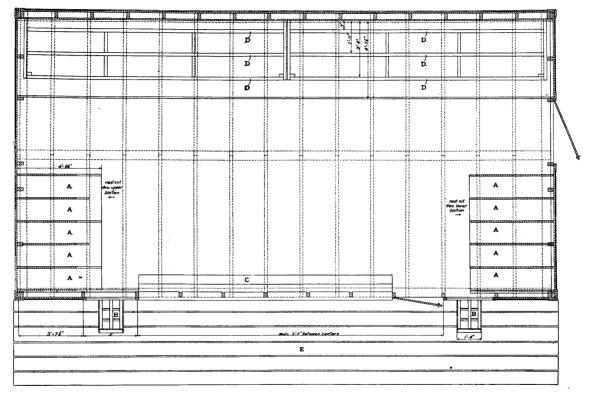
Floor plan of one unit of No. 3 curtain front poultry house. In this and the following four figures the significance of the letters is as follows: A.—trap nests. B.—runways to yards. C.—dry mash trough. D.—roosts. E.—walk. F.—front opening. G.—coop for broody hen. H.—spike to hang green food on, I.—grit trough. J.—curtain front,
